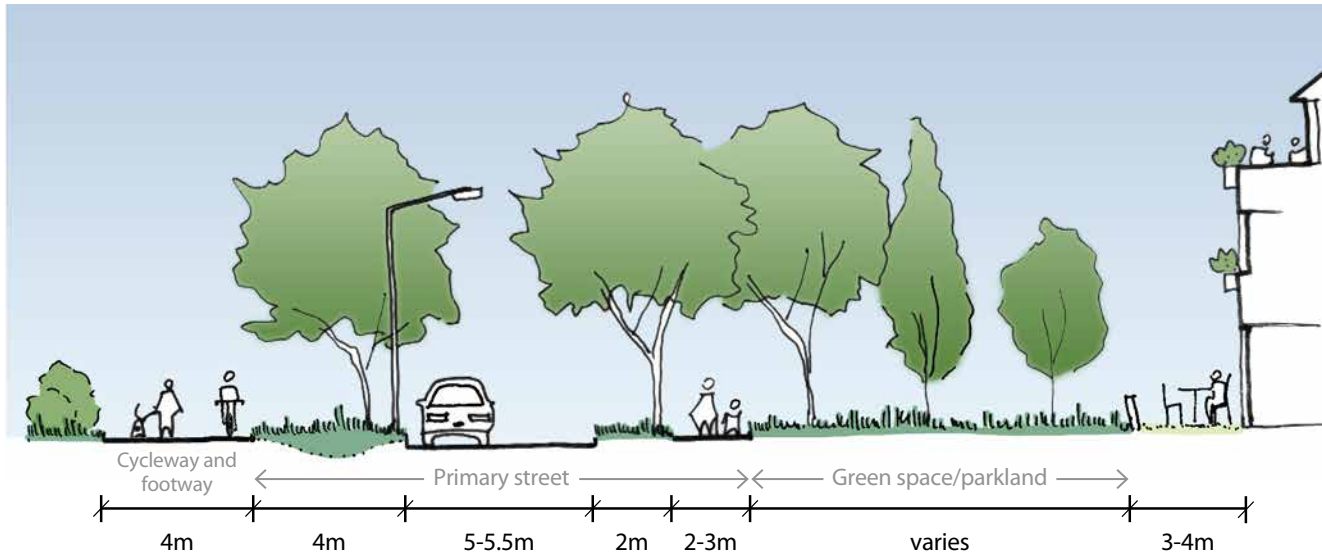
B-B – typical primary street cross section (refer to Fig. 18 for section location)
